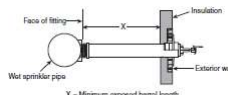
(a) Dry Sidewall Sprinkler Through Wall.
